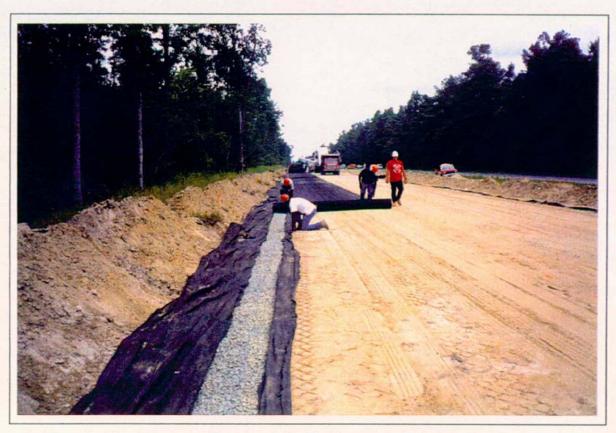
Unrolling geotextile at Sta. 375+50. Note geotextile is covering the edge drain.
